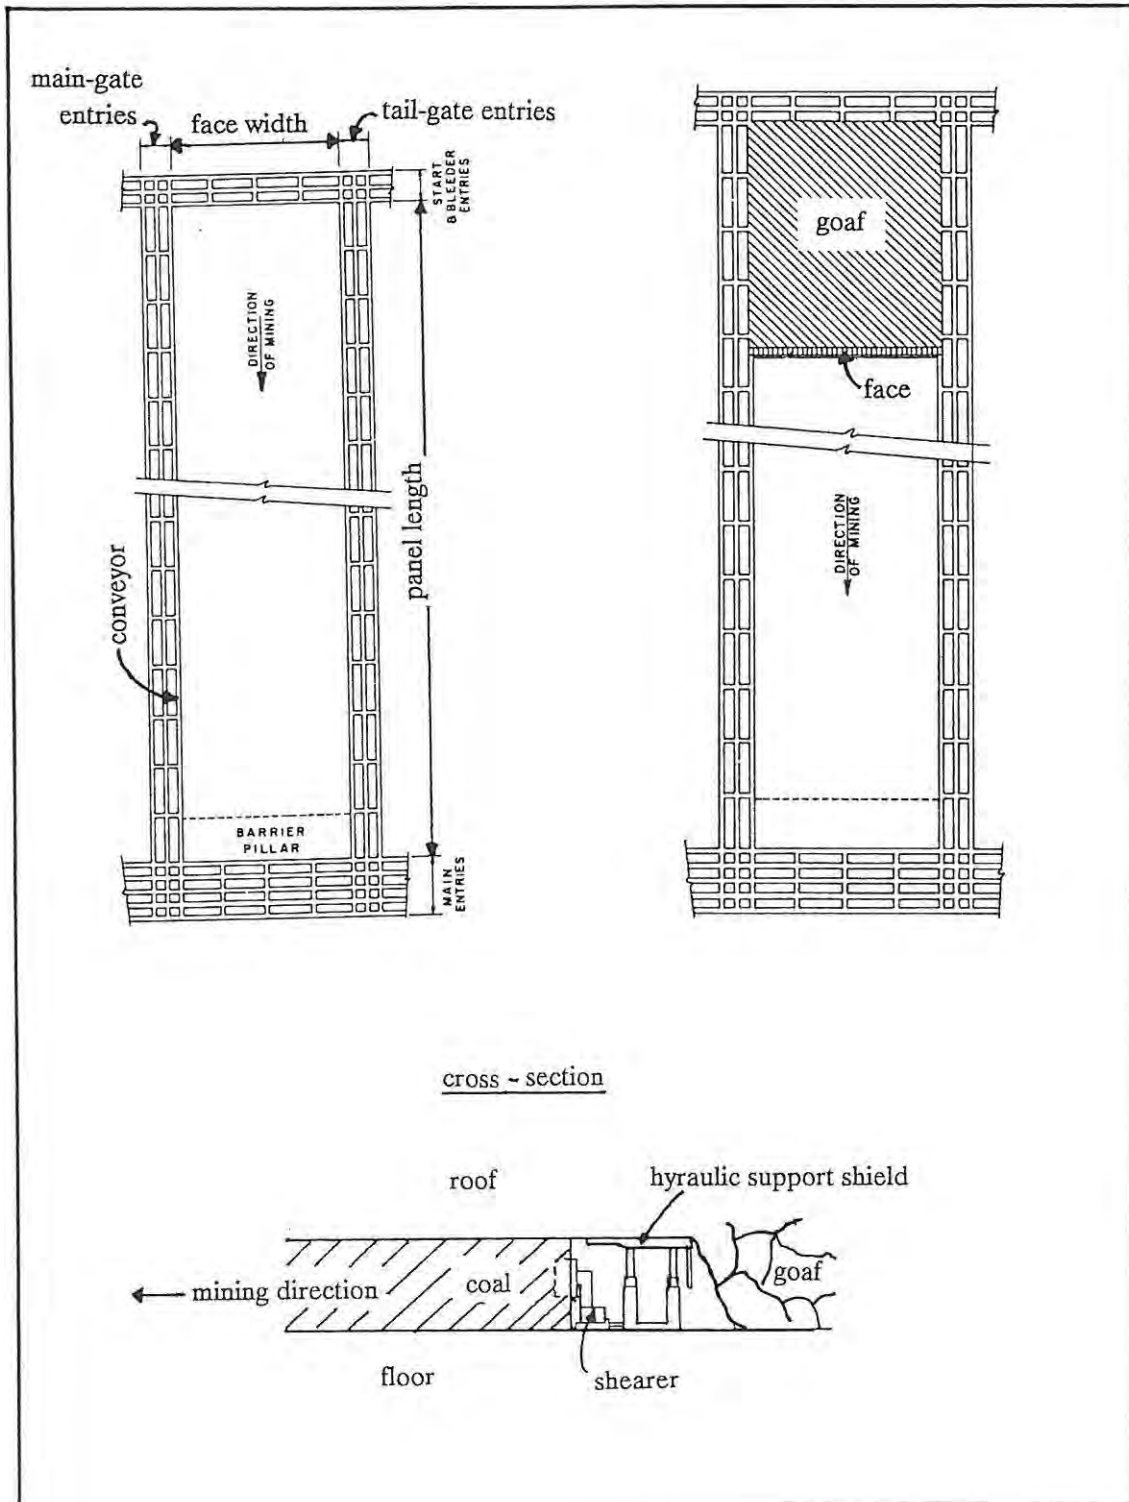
Components of a retreat longwall section (after Trent and Harrison, 1982; Ziolkowski, 1989).
